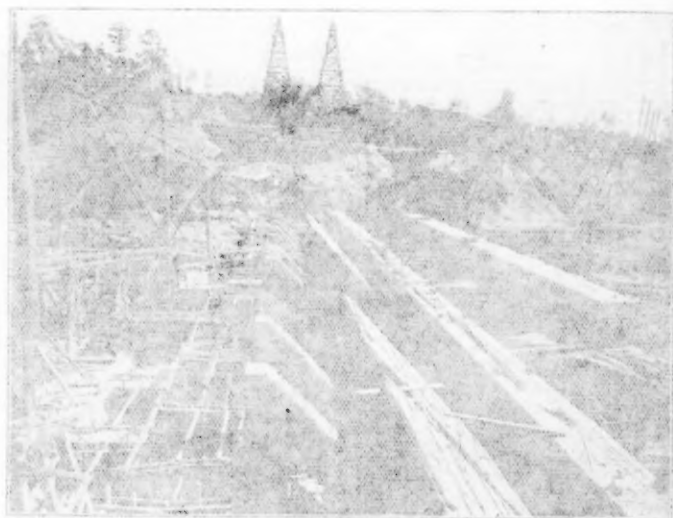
DRAINAGE FOR POWERHOUSE FORMS SECOND STAGE OF CONSTRUCTION.
